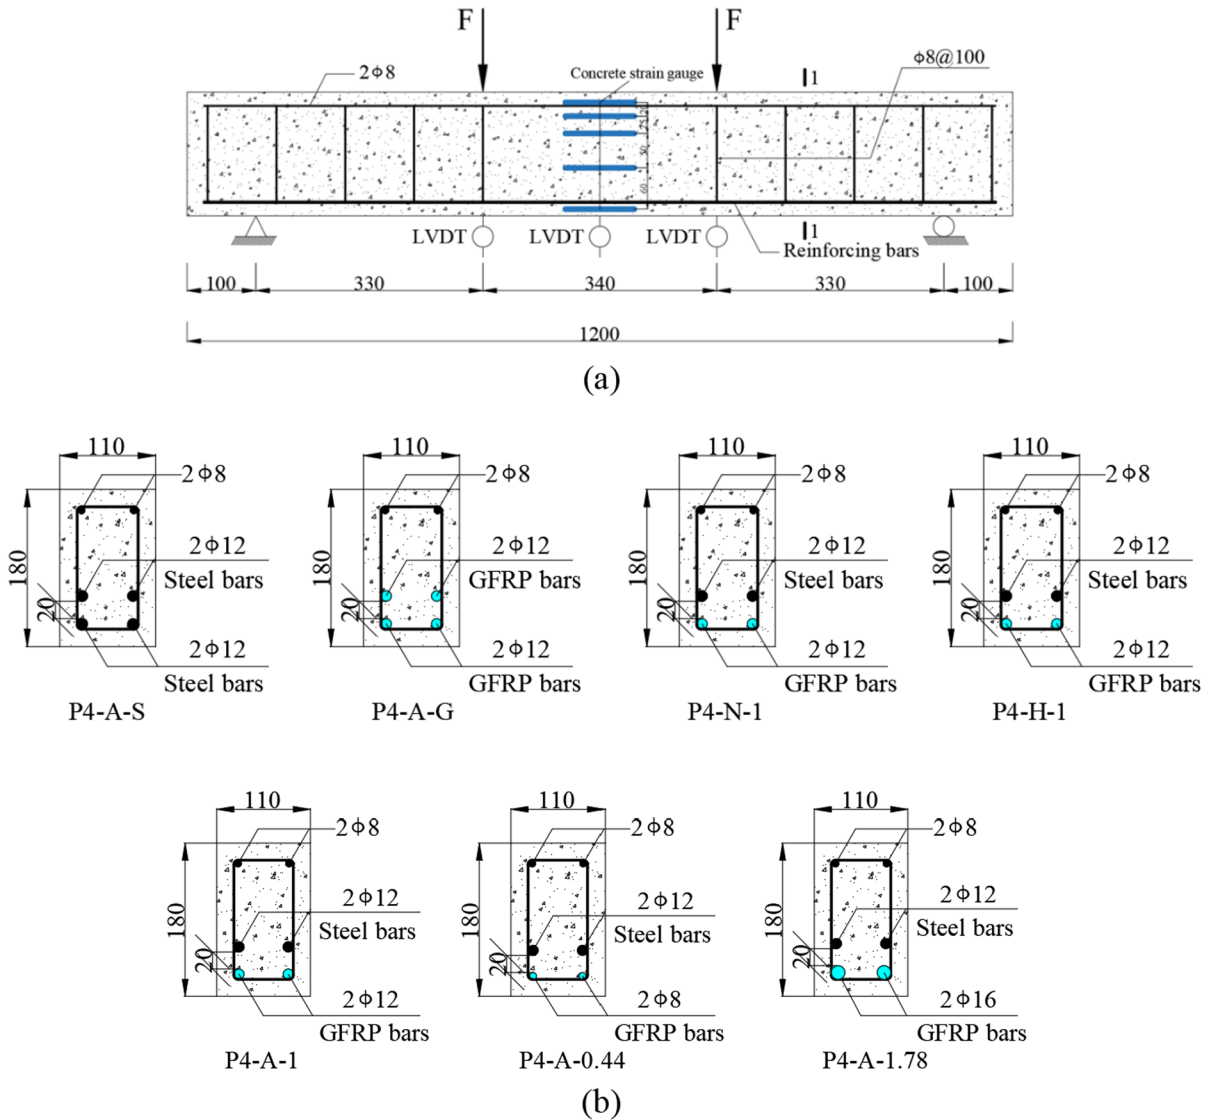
Test beams (Unit: mm): a beam size details; and b 1–1 cross-section reinforced
